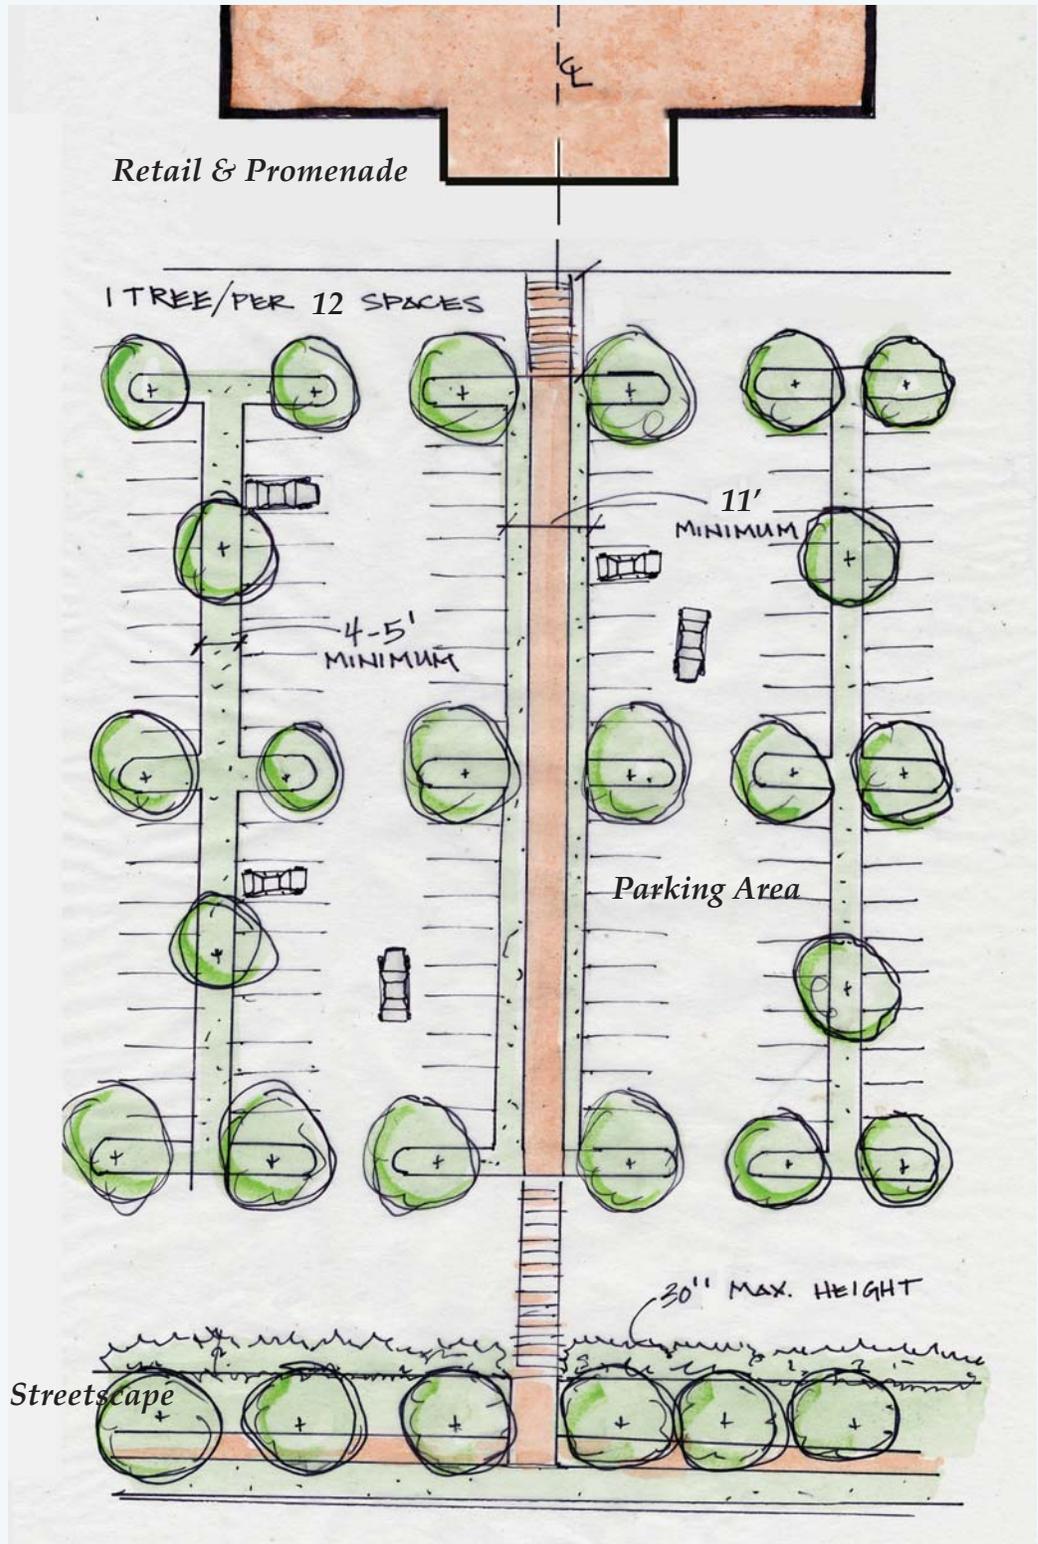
Prototypical site design for Belair/Columbia Node. Note the streetscape, pedestrian path through the site, and parking lot landscaping.
